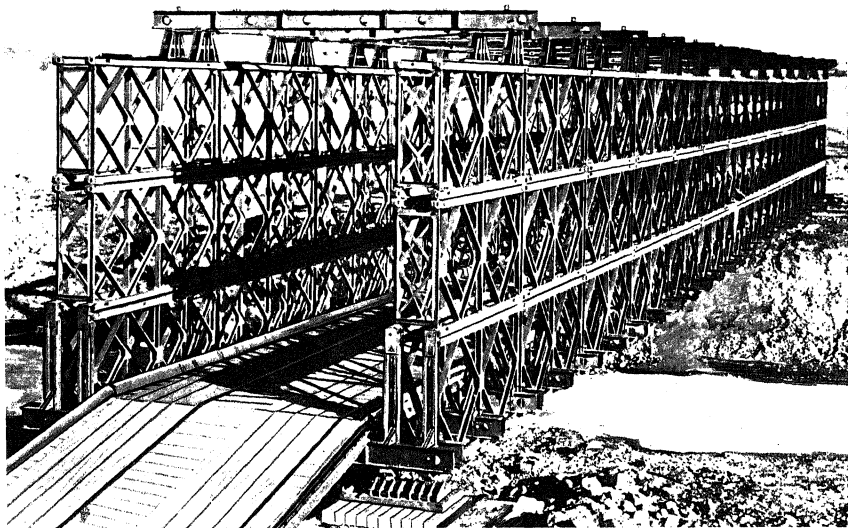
Overhead bracing on triple-story bridge using overhead-bracing supports.
